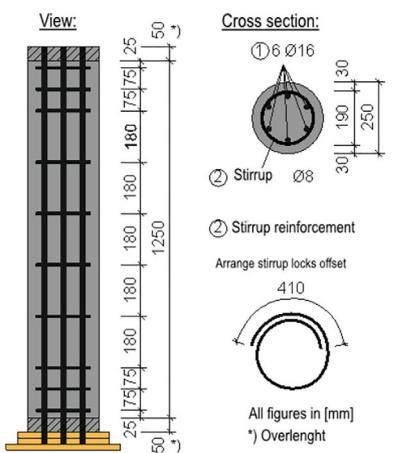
Bending schedule of the column (left) and crosssection with full surface coating of the reinforcement (right). Source: Institute of Building Materials, Concrete Construction and Fire Safety
